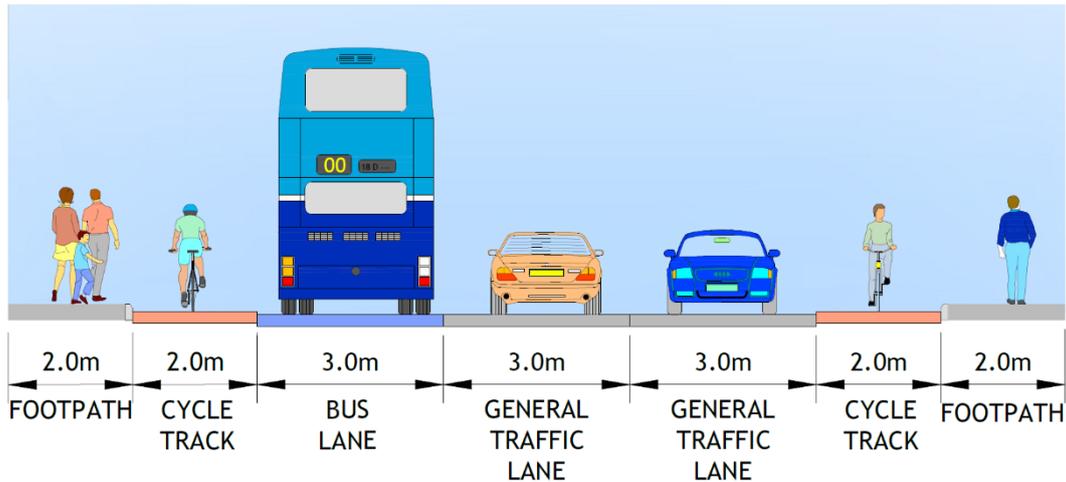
Cross-Section C-C (Relevant to RF5)
